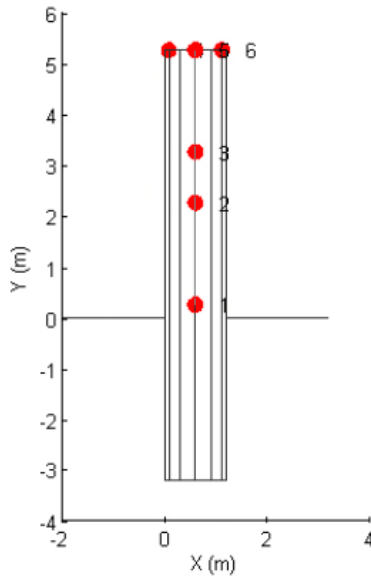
Test layout for pile P5 and P6 (elevation view). Sensors in red dots.
